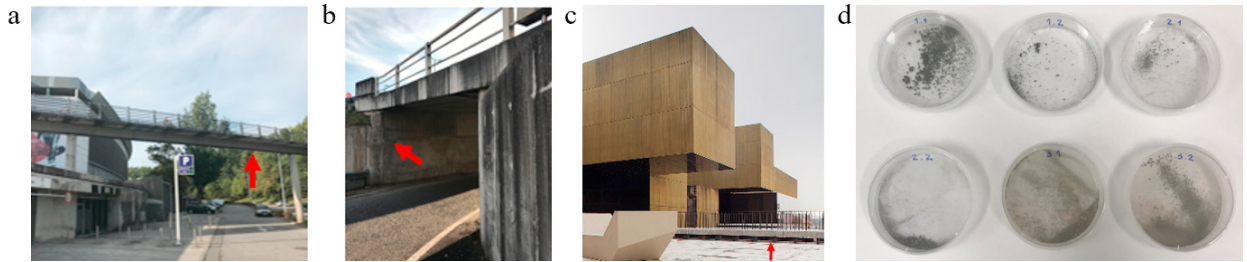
(a) Footbridge over the street João XXI, (b) Overpass of access to Shopping Guimarães, (c) Concrete bench of the Plataforma das Artes and (d) Collected material.
